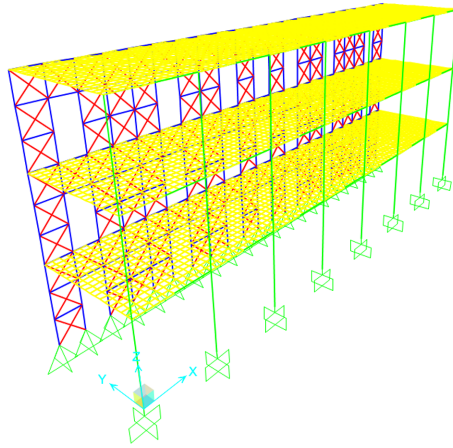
Three-dimensional modal of the frontal and façade walls, and membrane floors
